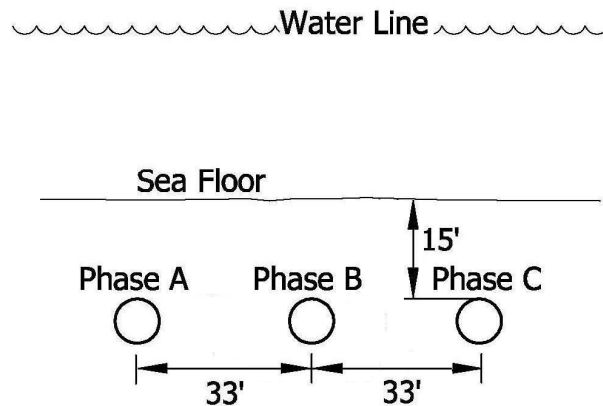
Schematic of the proposed configuration for the 345-kV submarine cable. Conductors are spaced 33 feet apart and 15 feet below the seafloor.
